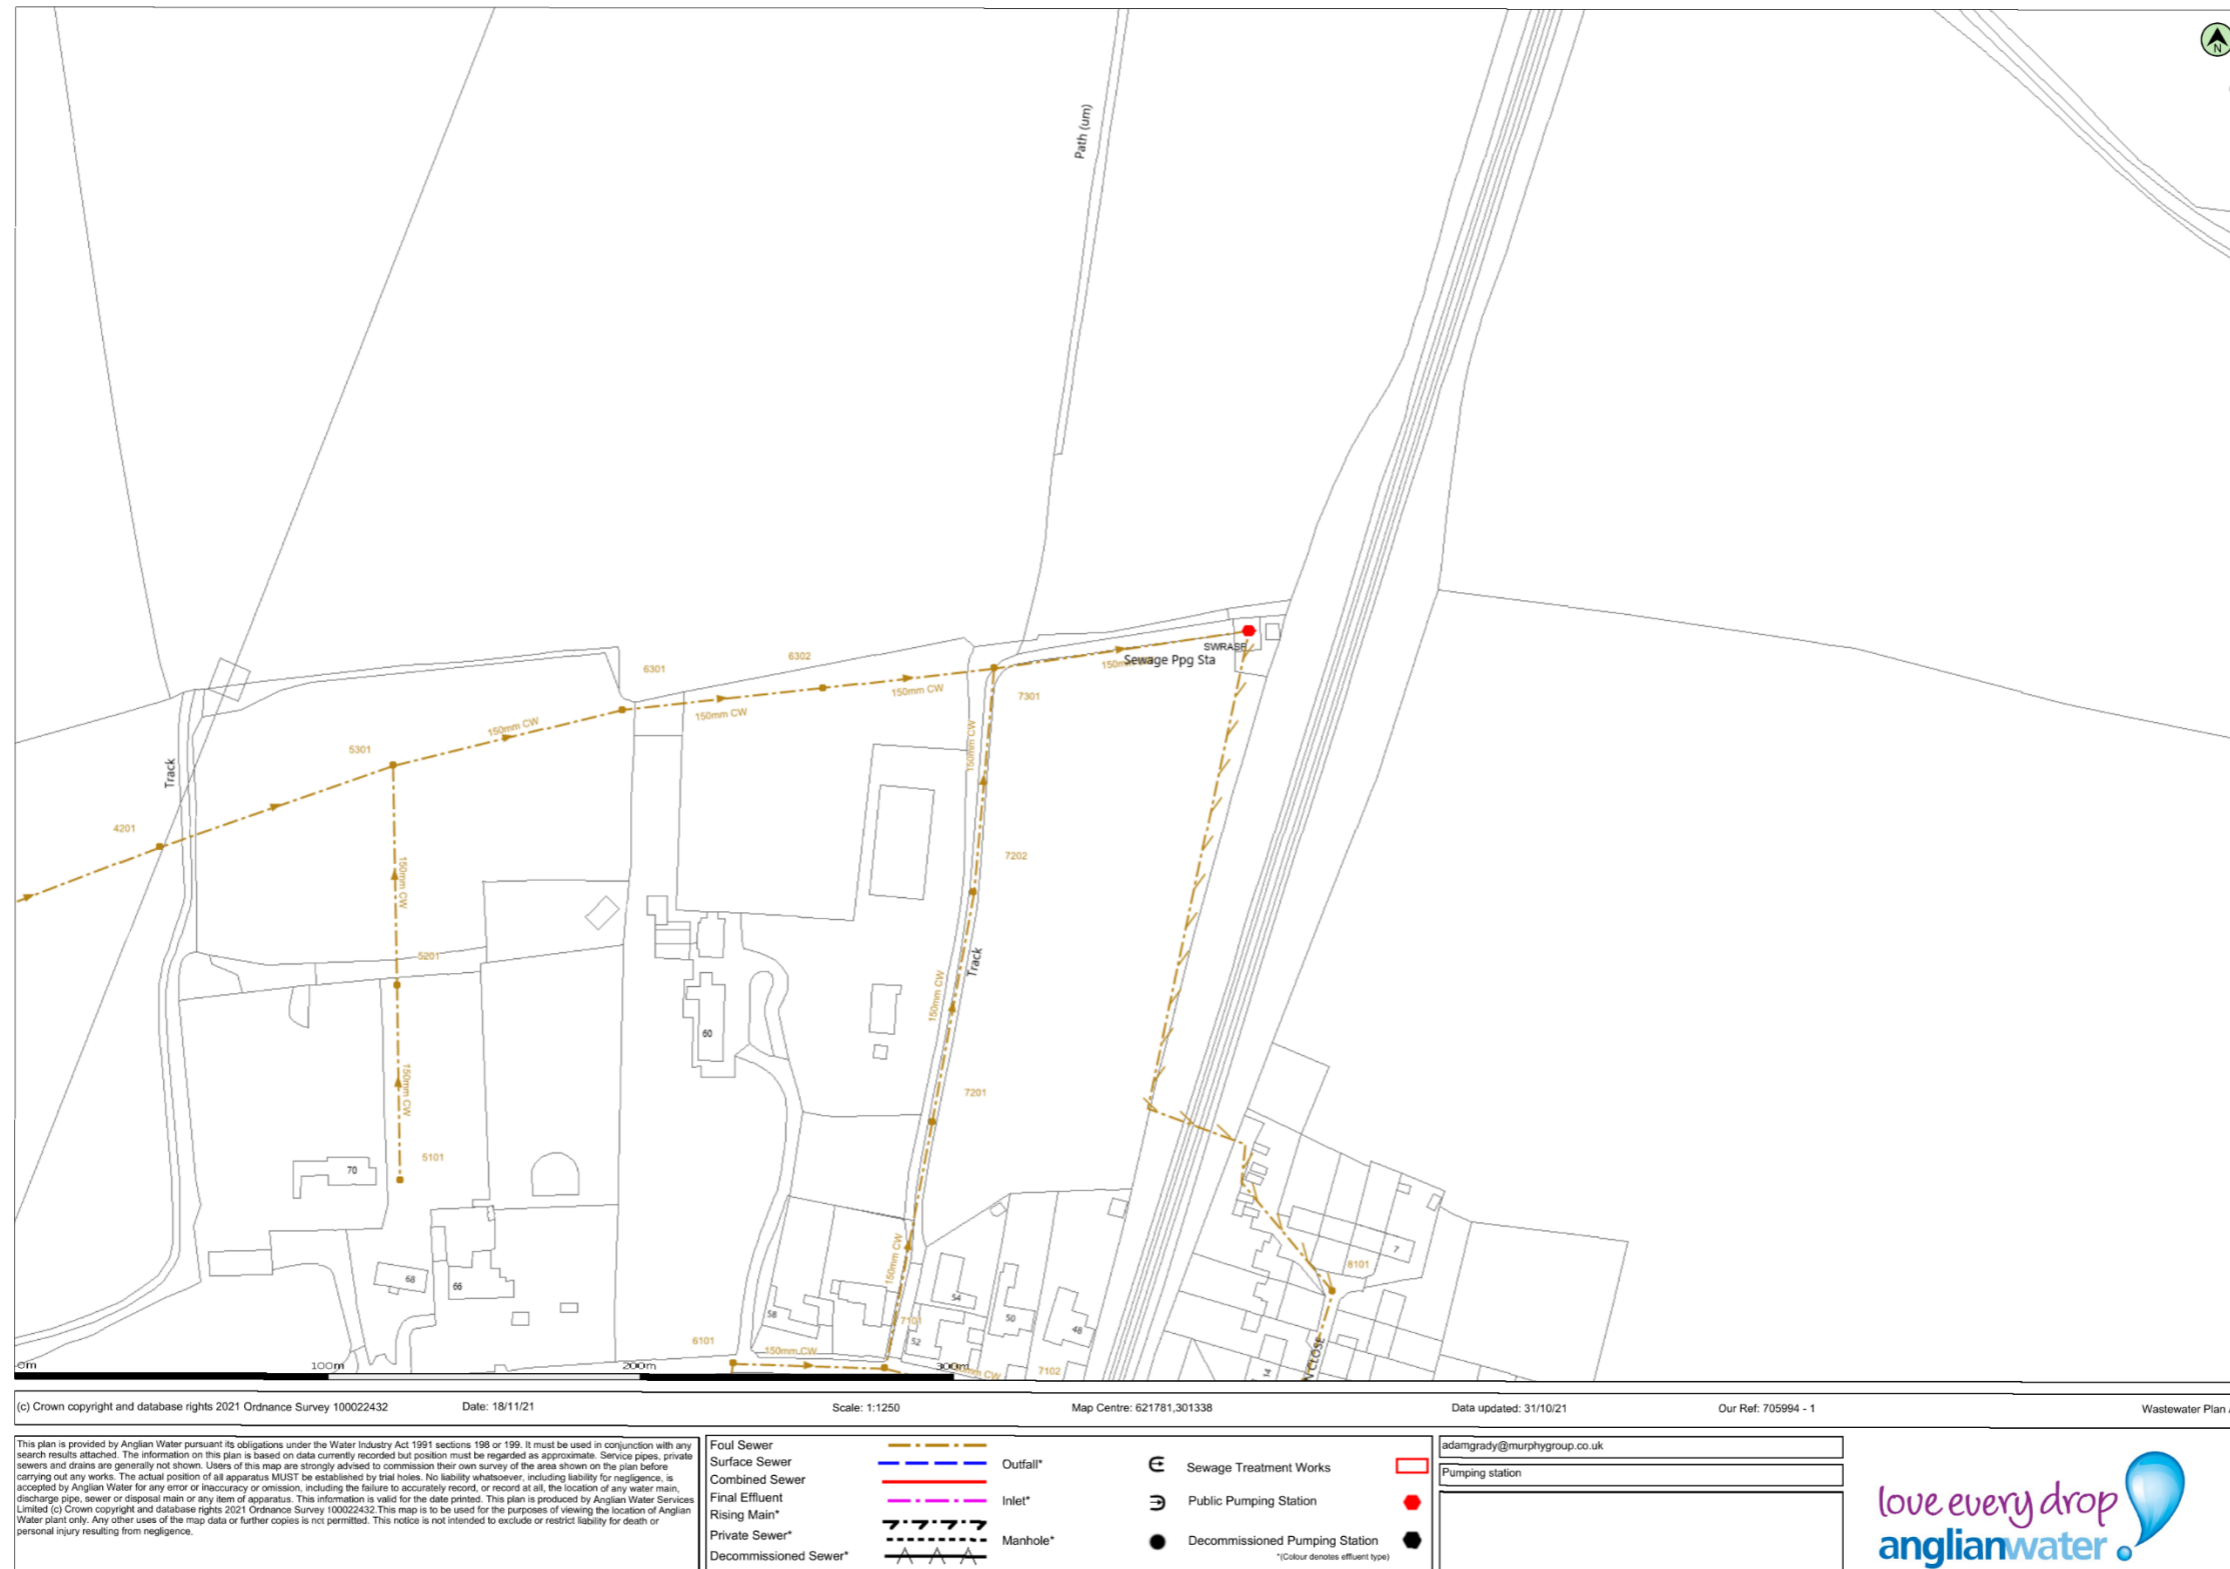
Anglian Water Drainage Plans for Land to the South of Hickling Lane
